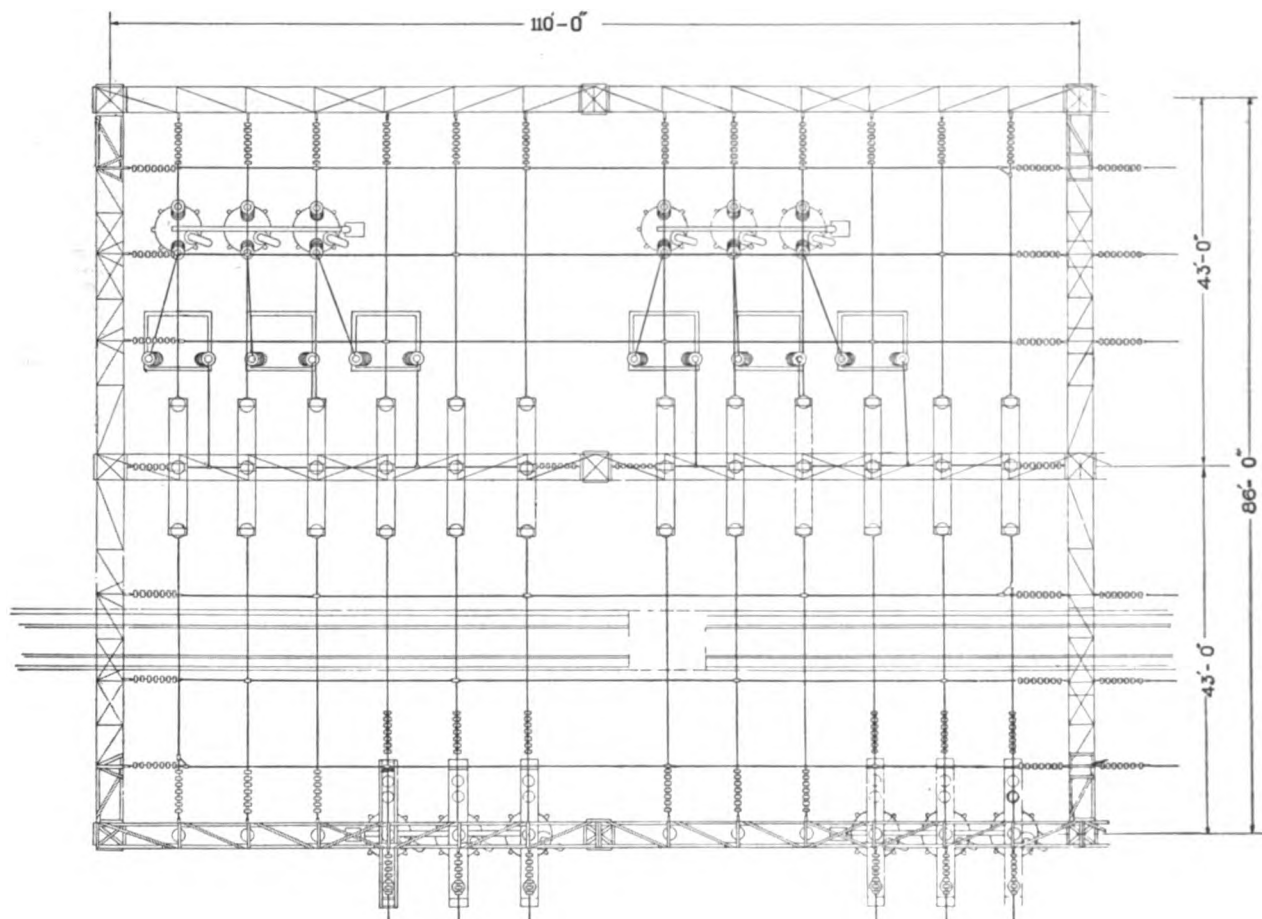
Layout of 135-kV outdoor station. Plan.
